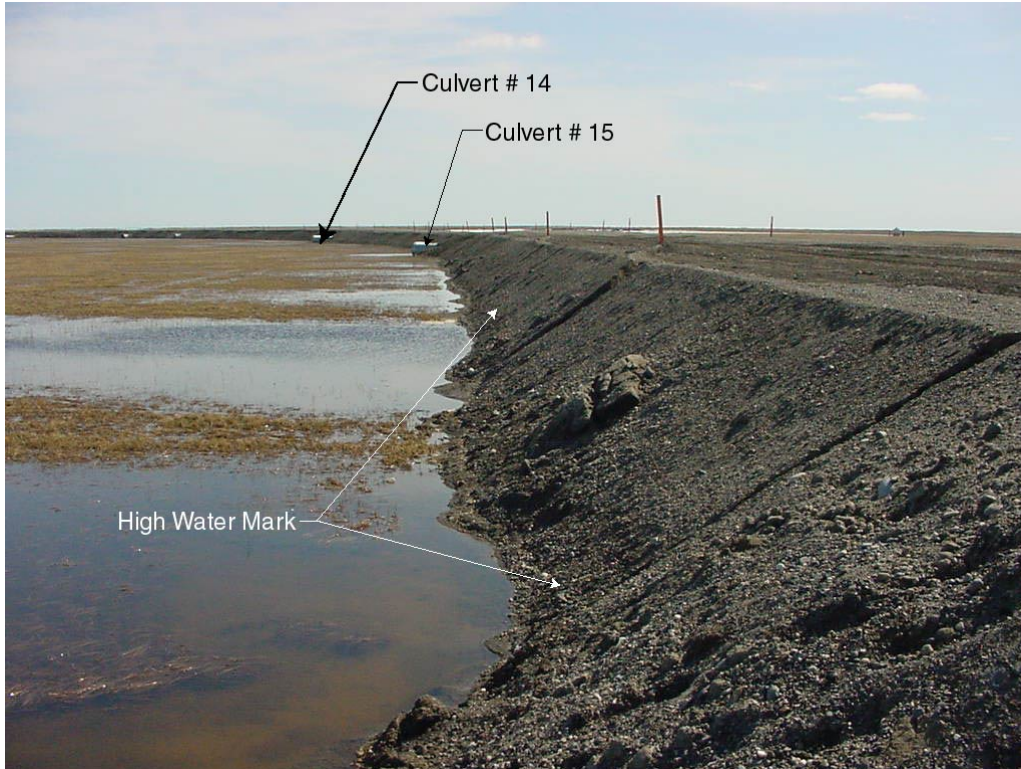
Facing east from Culvert #16 along the north side of the CD-2 access road. (6/16/01)
